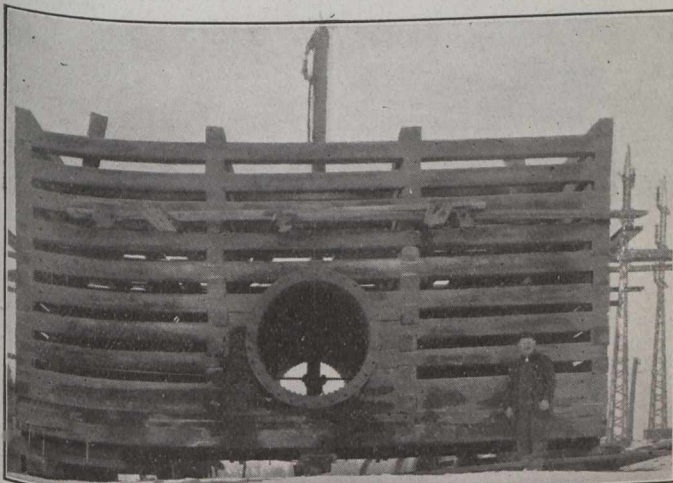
Timber Intake Crib Under Construction for Beach Pumping Station, Hamilton.
